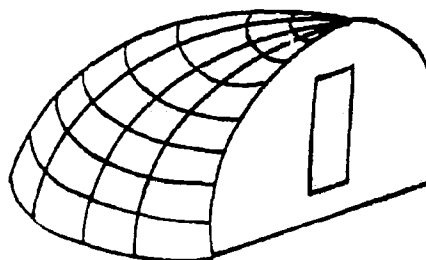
Structure as modified, with a straight closure wall on the open end.
